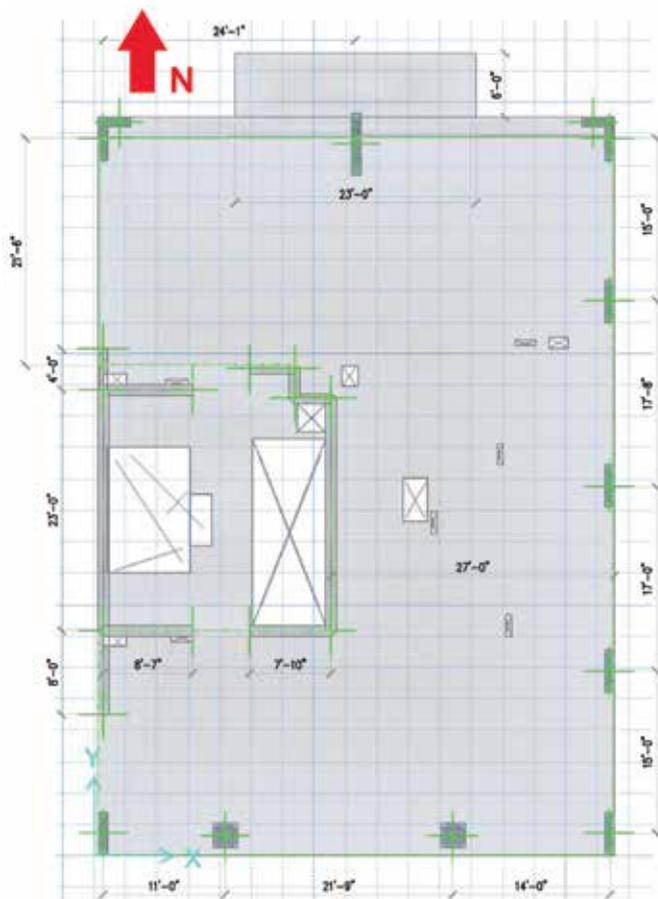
Floor plan of the studied slab (Note: ' = ft and " = in.; for example, 4'-0" = 4 ft 0 in.)
